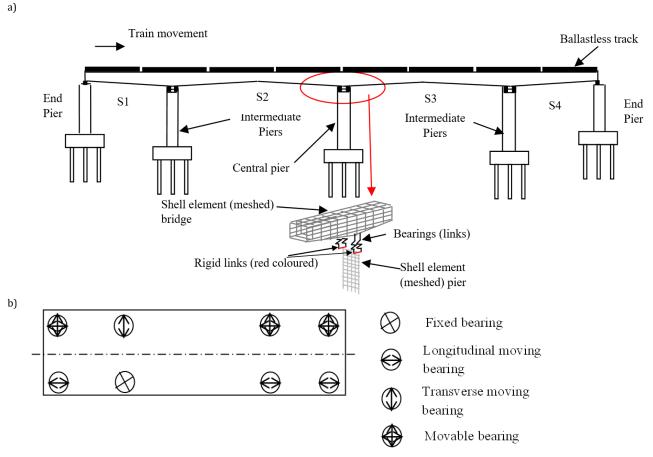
Models of (a) continuous bridge, (b) layout of bearings
